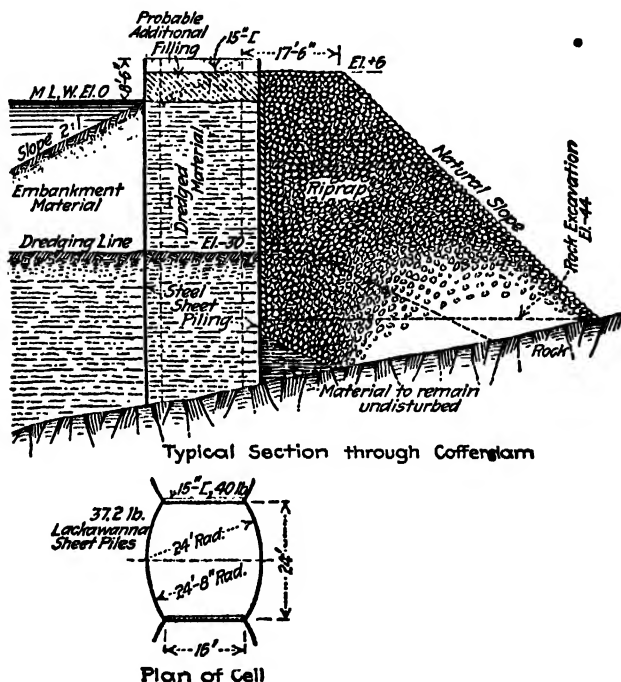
Cellular Steel Sheet-Pile Cofferdam.
